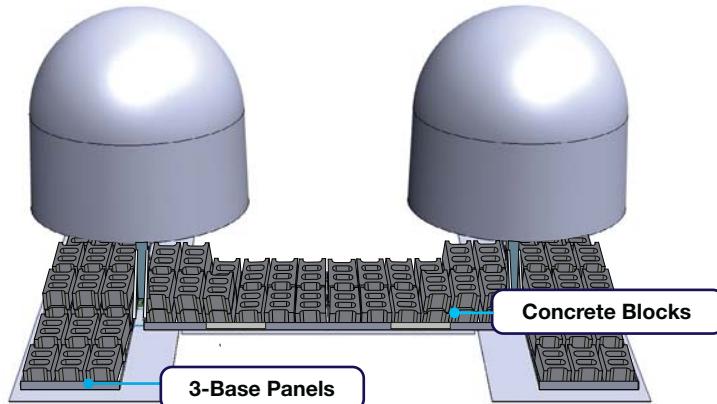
Placing Concrete Blocks on Base Panel of NPM
